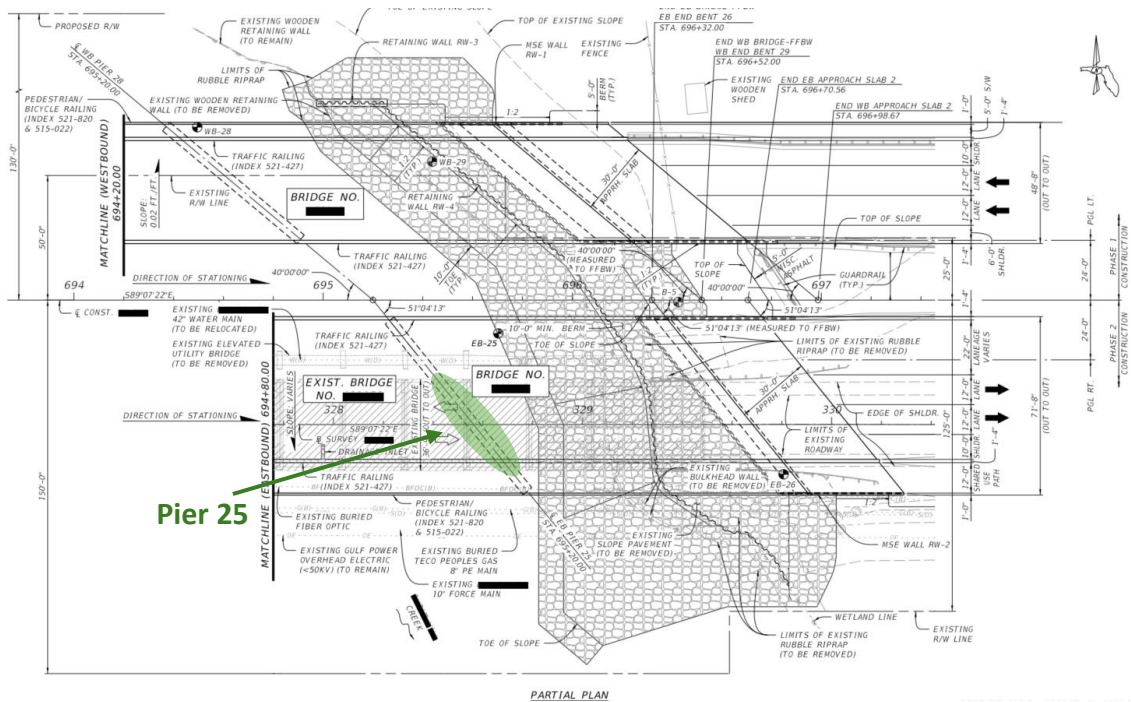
Partial plan – Selected Pier no.25 of the Eastbound Bridge (B1-06)
